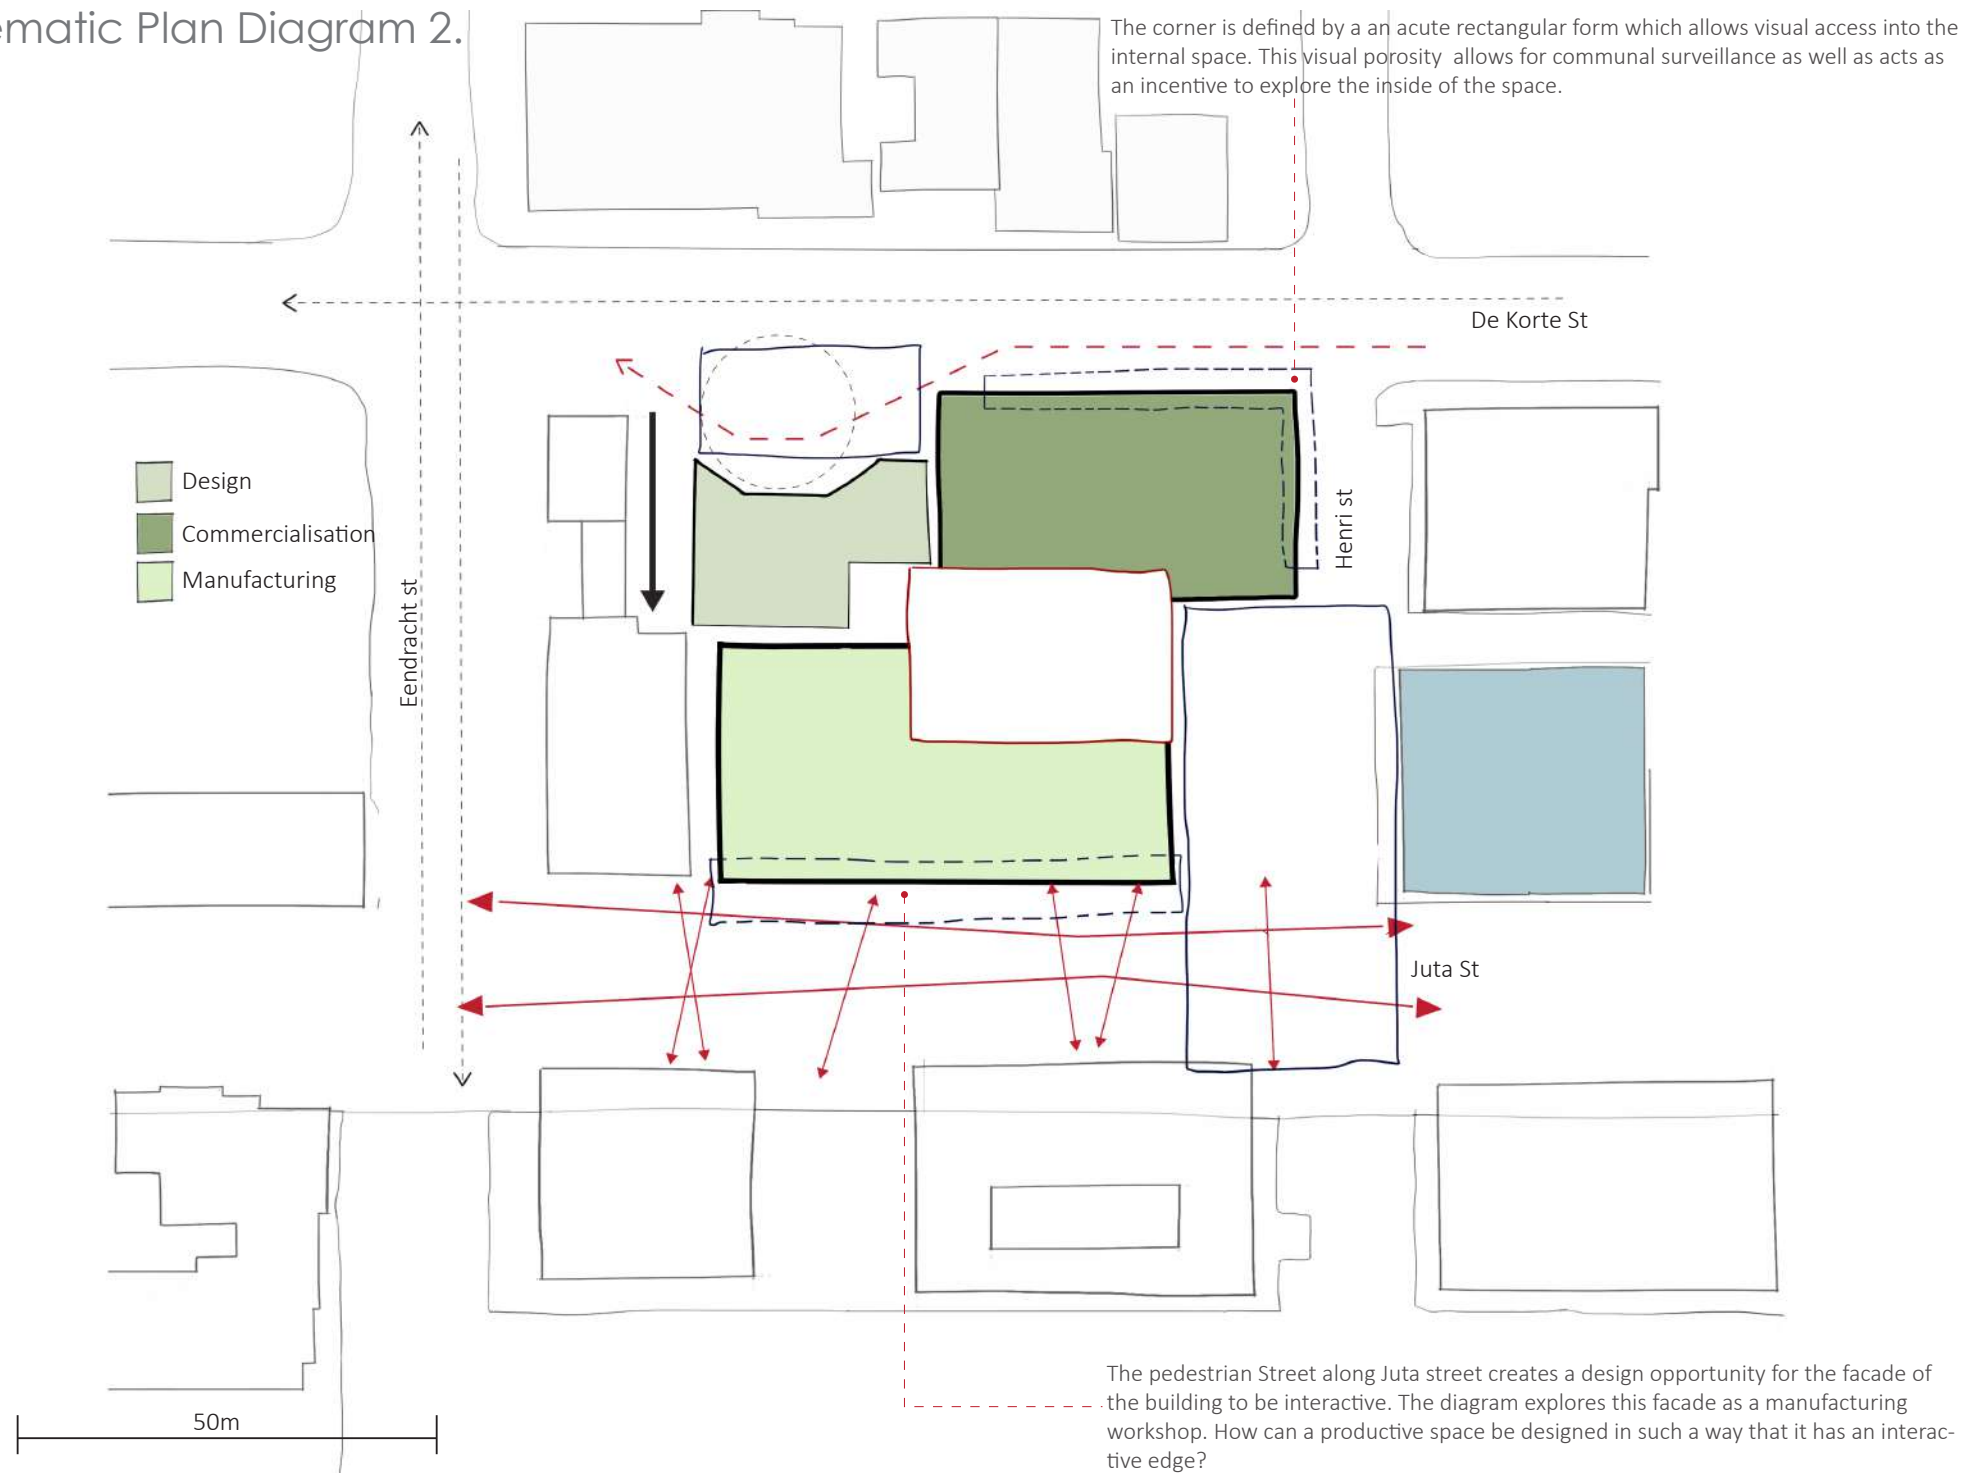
(v): Diagram of Schematic Plan 2, Exploring Layout, (Author 2020).
